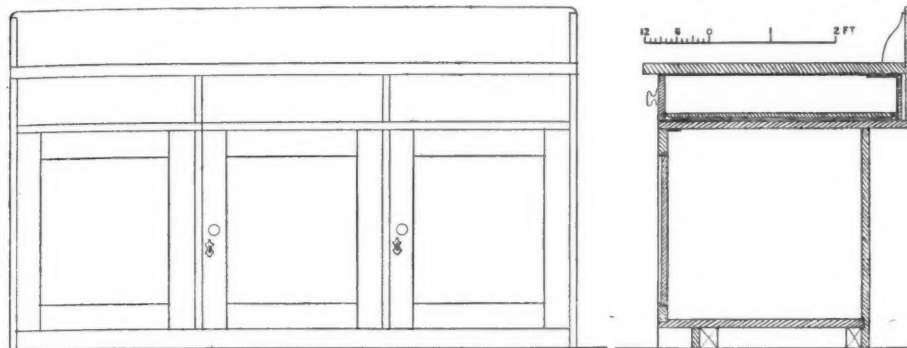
STUDENTS' WORKING BENCHES IN ELECTRICAL LABORATORY, FIG. 1, A.
